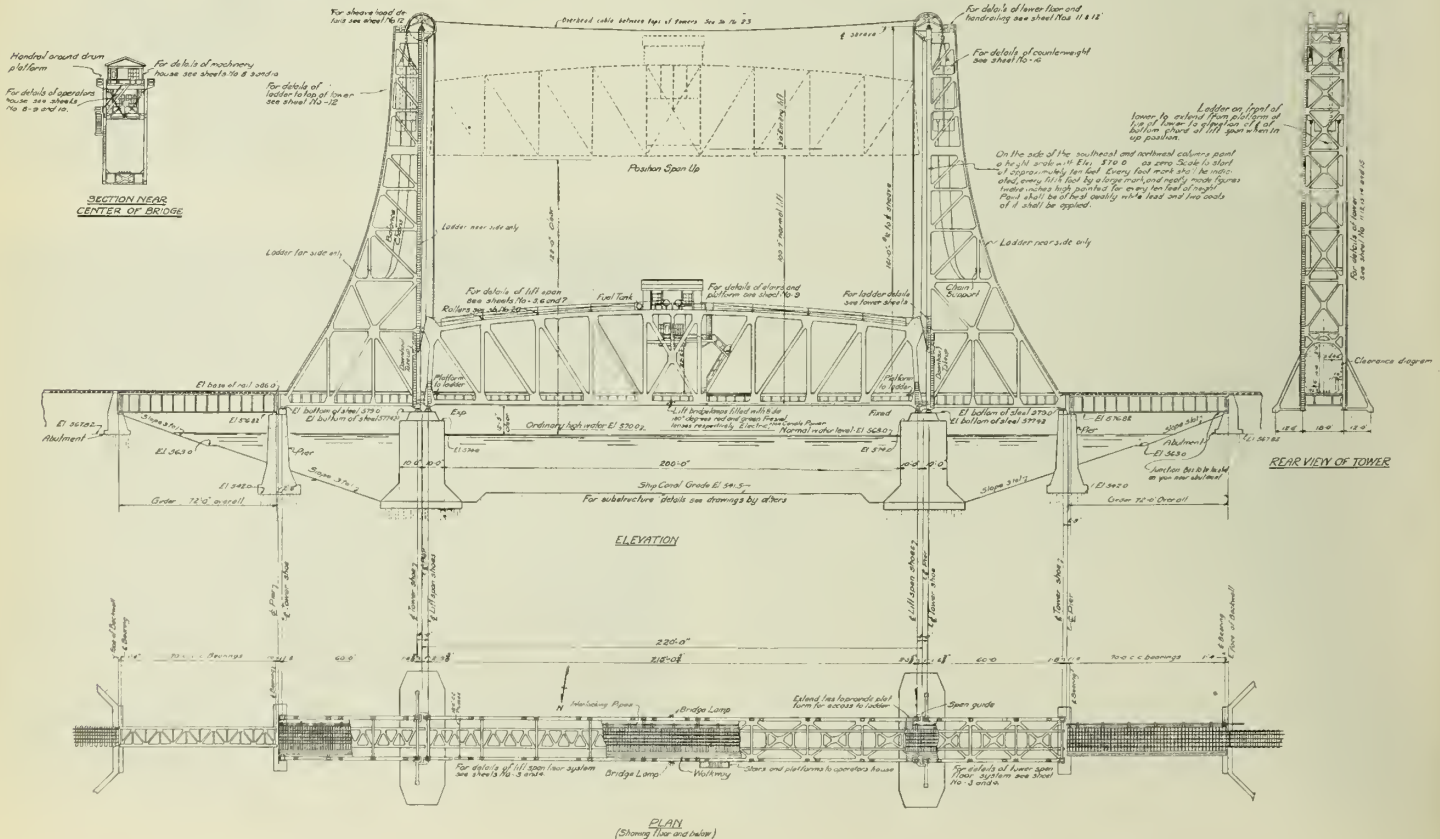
Bridge No. 17—General Plan and Elevation.
